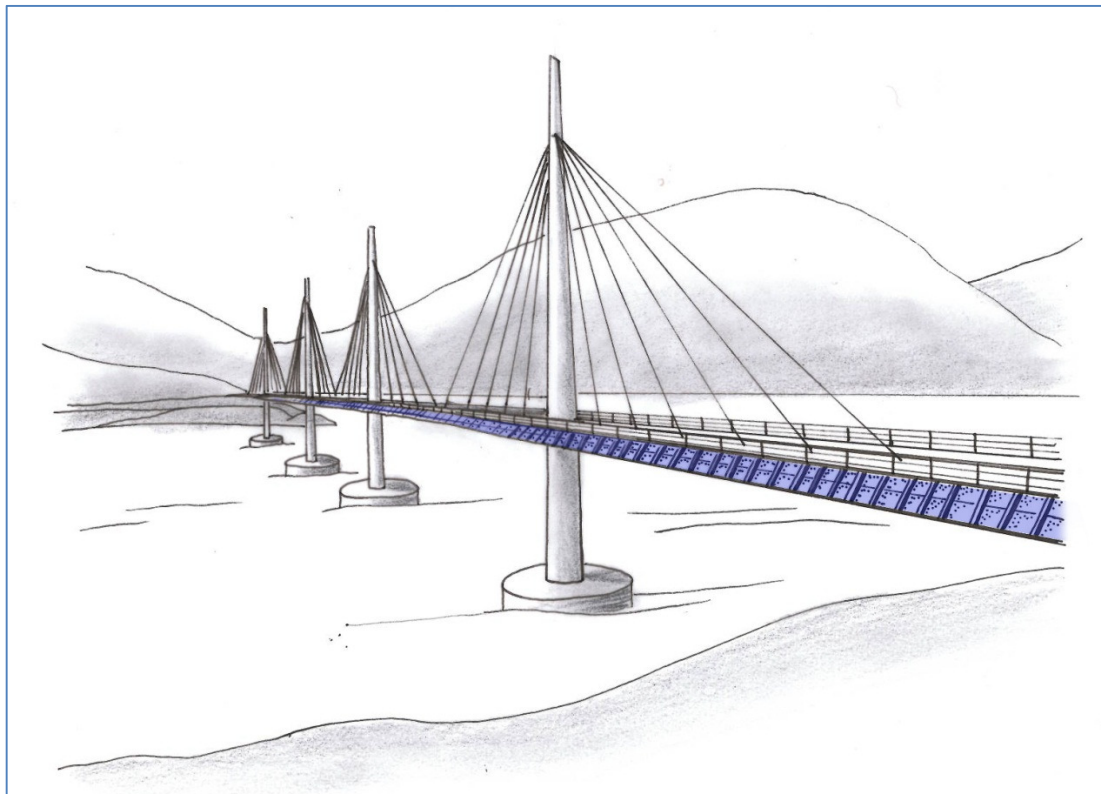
Cable-stayed bridge on floating foundations, with side-mounted panels
